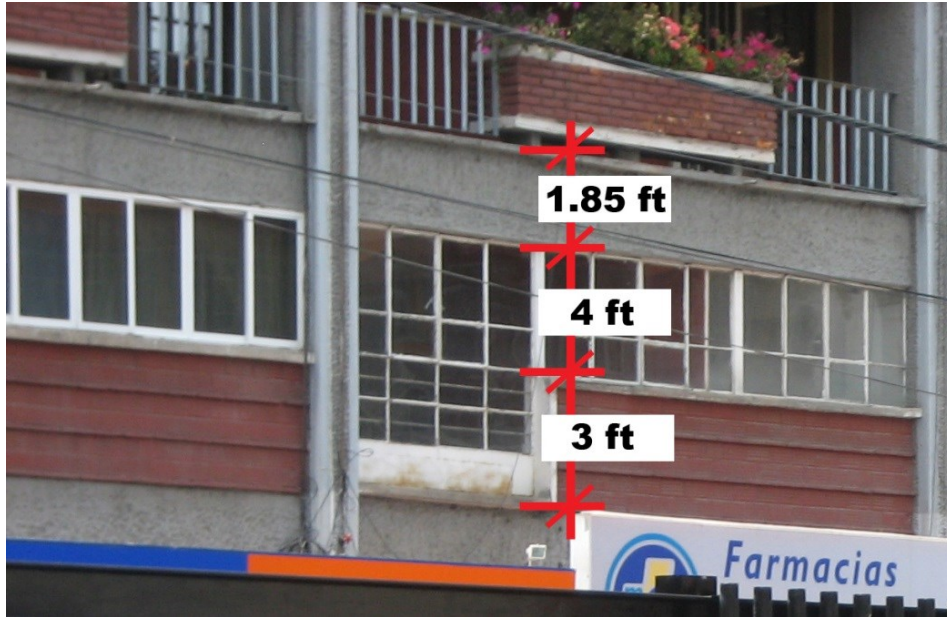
Detail to Calculate Height Floor-to-Floor on the Façade for the Apartments. (Photo by Jose Luis Bermudez Alcocer).
